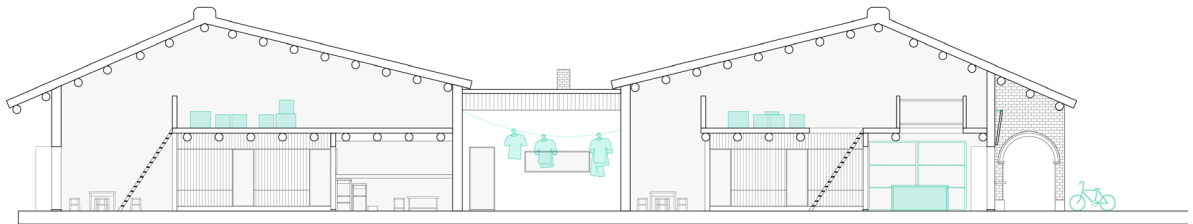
Minnan-style streethouses feature interior mezzanines between the ground floor and roof that could be adapted for the storage of family or shop goods. Courtyards are outdoor spaces that provide ventilation and sunlight into the segments.
